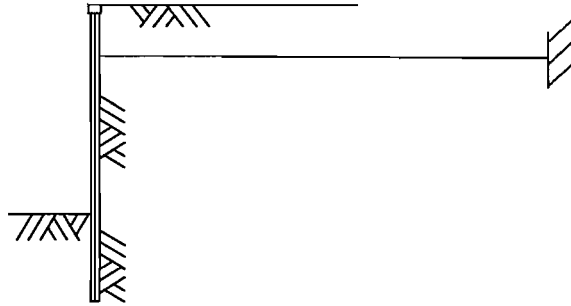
Propped cantilever style retaining wall with high level anchor
